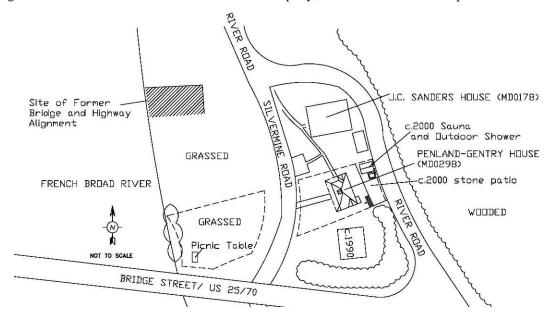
Site Plan of the Penland-Gentry House (MD0298), Property Boundaries, and Surrounds
